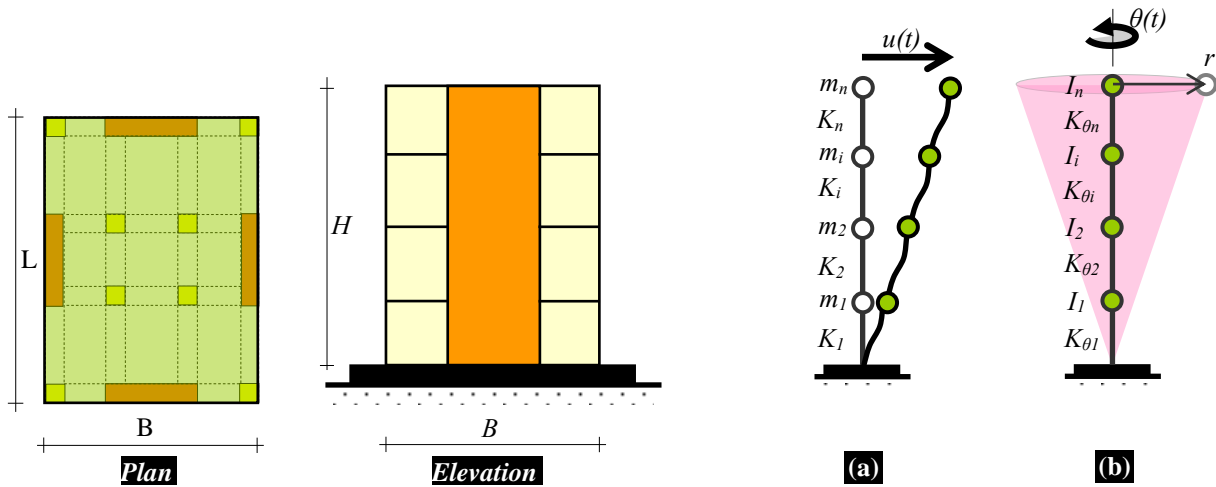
Building elevation and plan with a stick model (AM4) having mass lumped at each storey showing: (a) translational and (b) torsional modes
